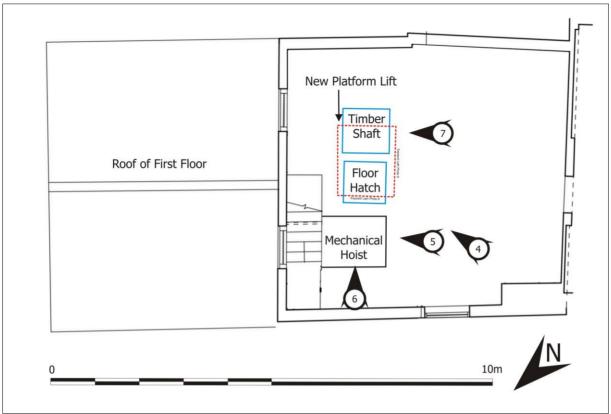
Second Floor Plan with location of new lift in red and photo locations numbered.
